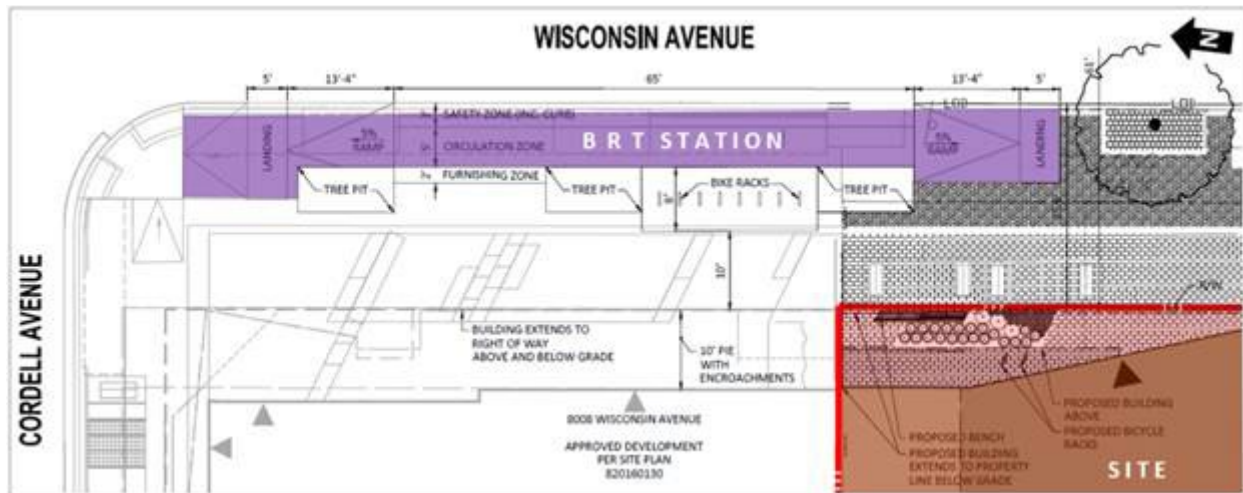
BRT Station Footprint Concept approved for Site Plan 820140130
